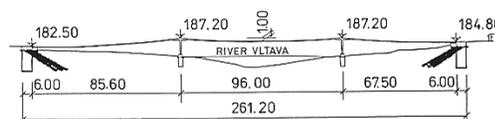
Prestressed concrete footbridge, total length 261.20 m.
